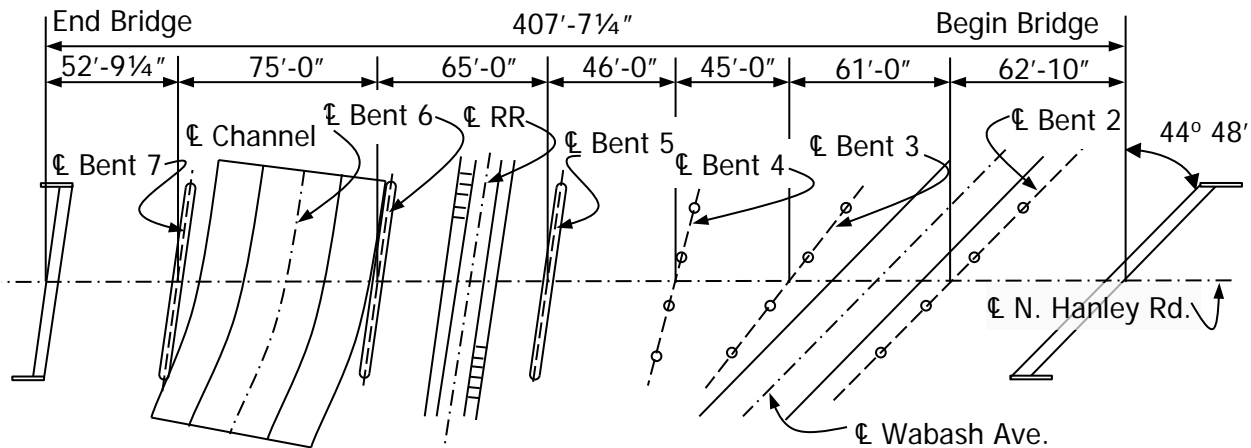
Plan view and dimensions for Bridge Number 15558X.
